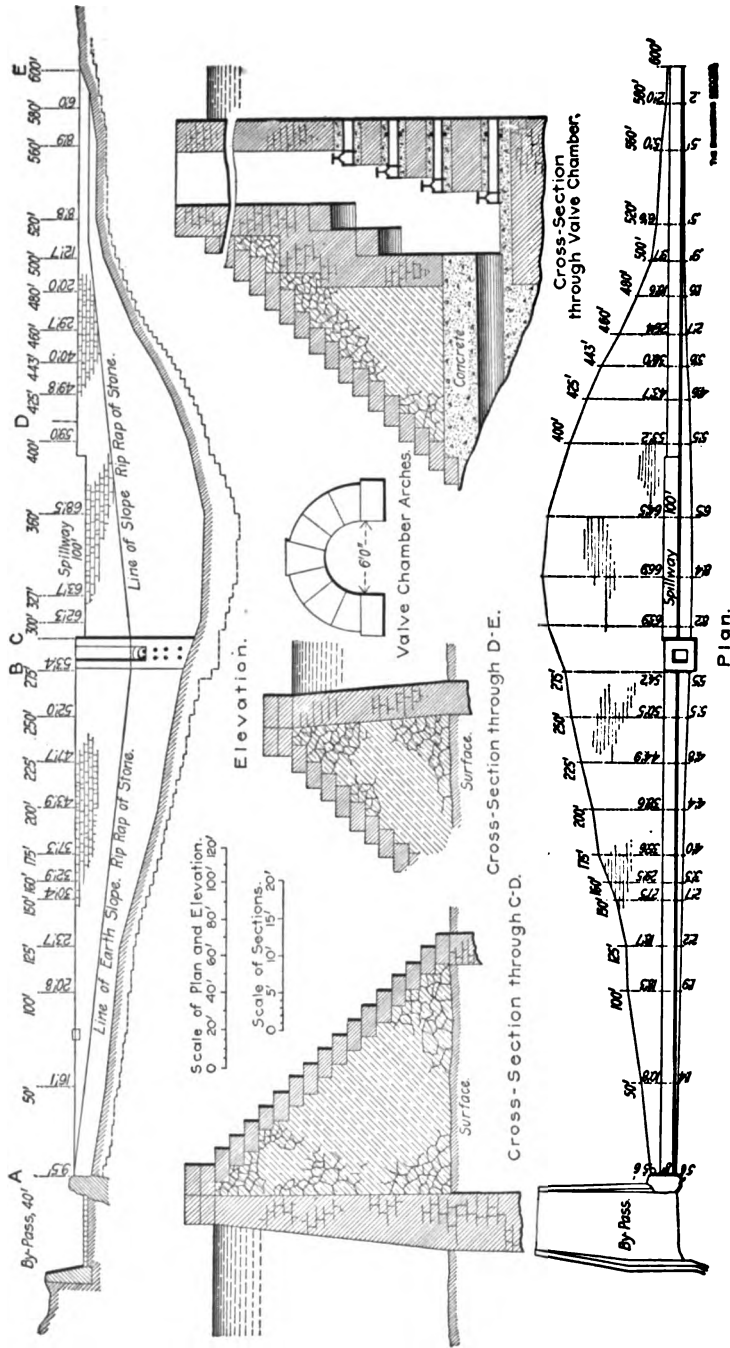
CASTLEWOOD DAM, COLORADO; PLAN, SECTIONS, AND ELEVATION.
